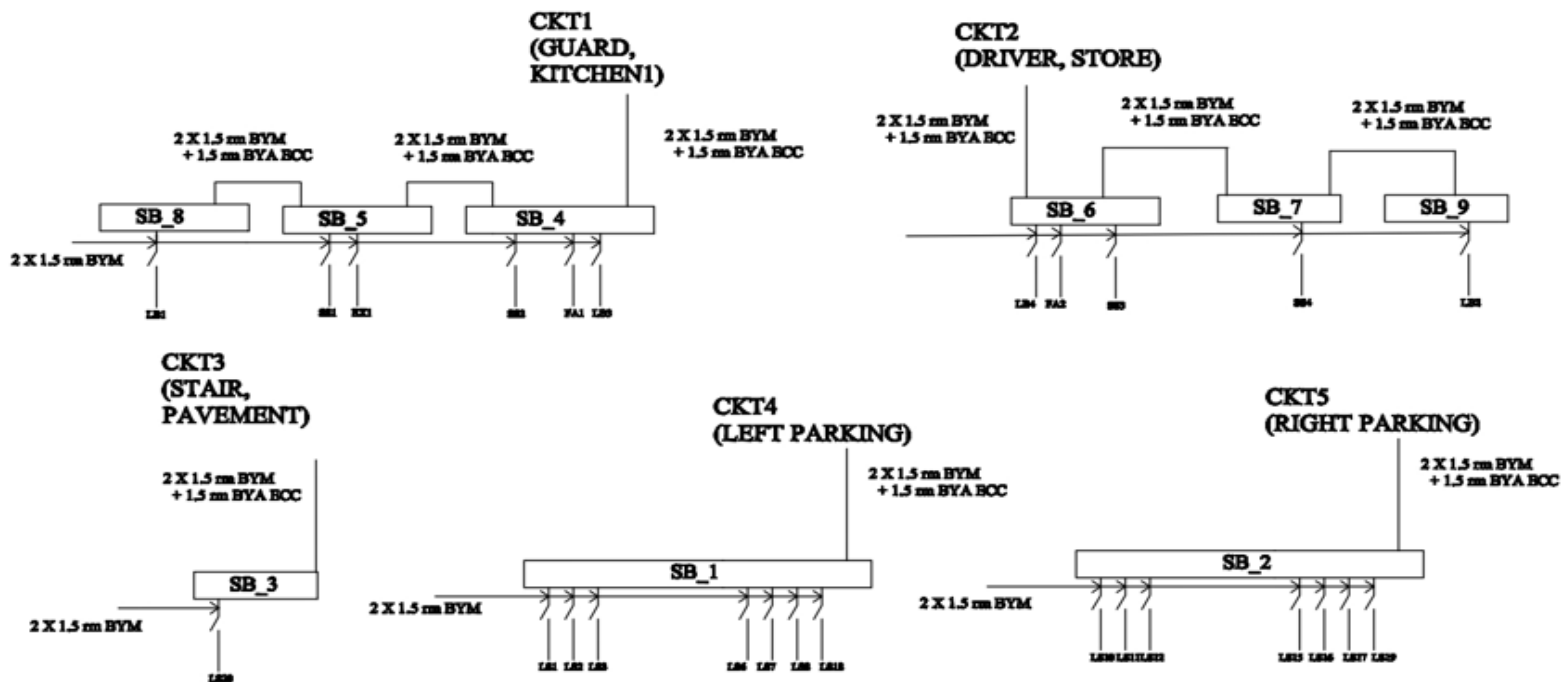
Switch Board Connection Diagram (Ground Floor)
